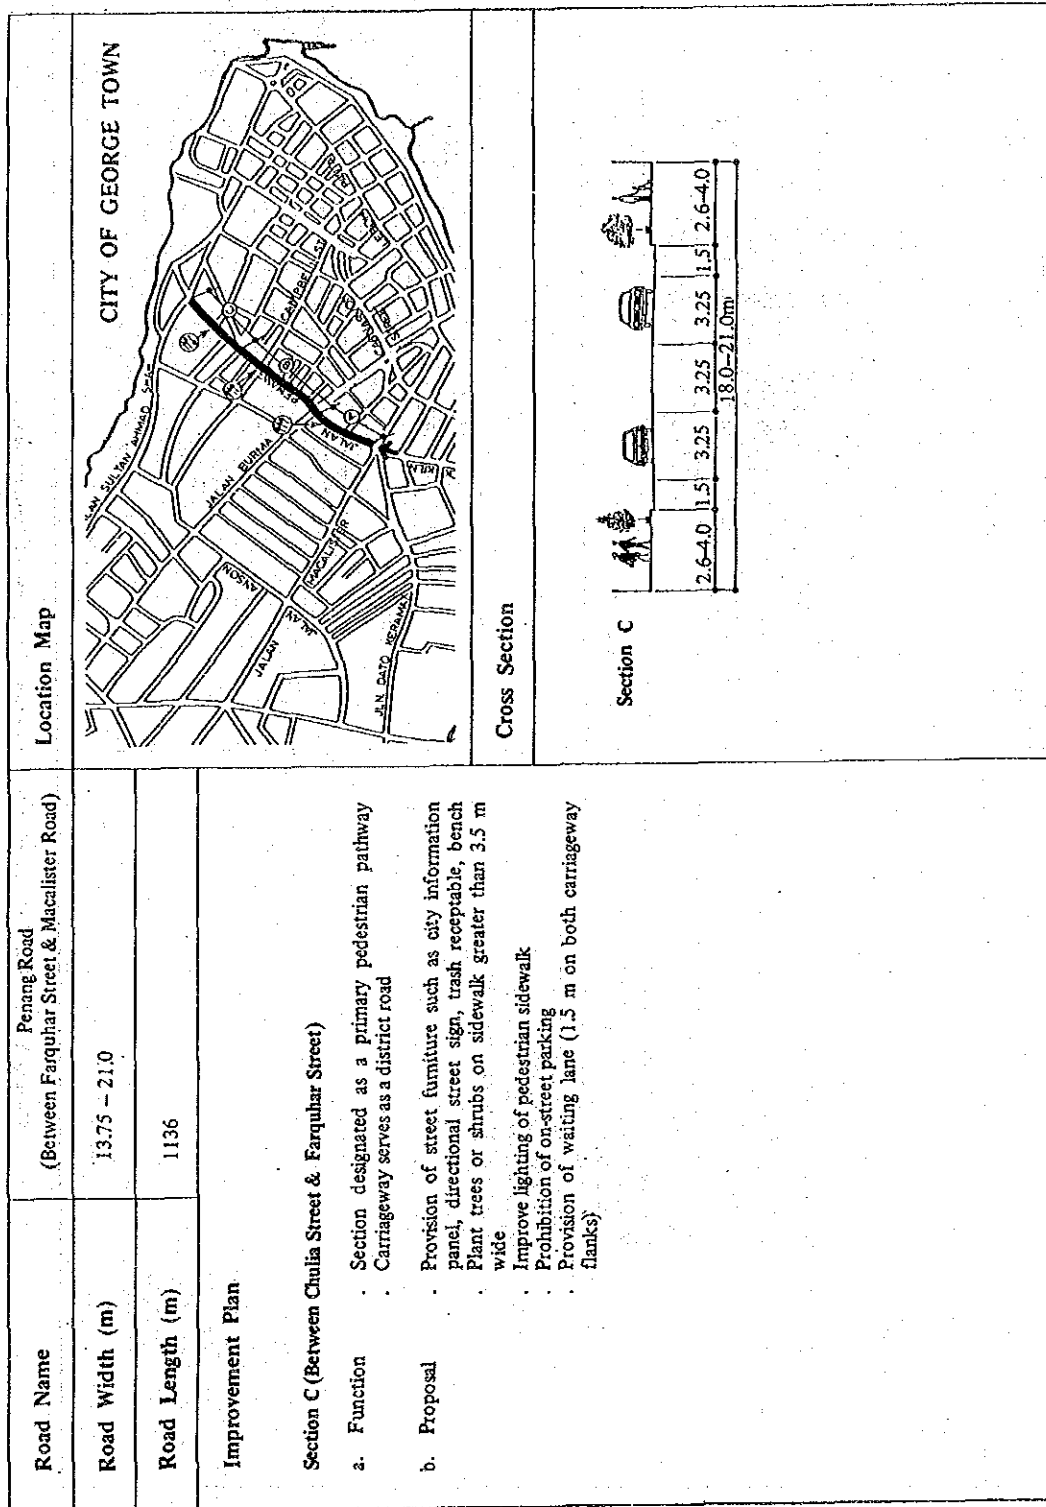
Pedestrianisation Improvement Plan (18) – Penang Road
